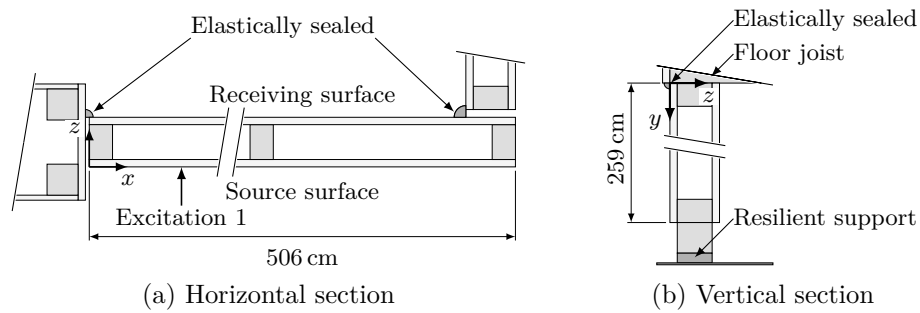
Sections of lower timber-frame wall of the test structure indicating details on the boundary conditions.
